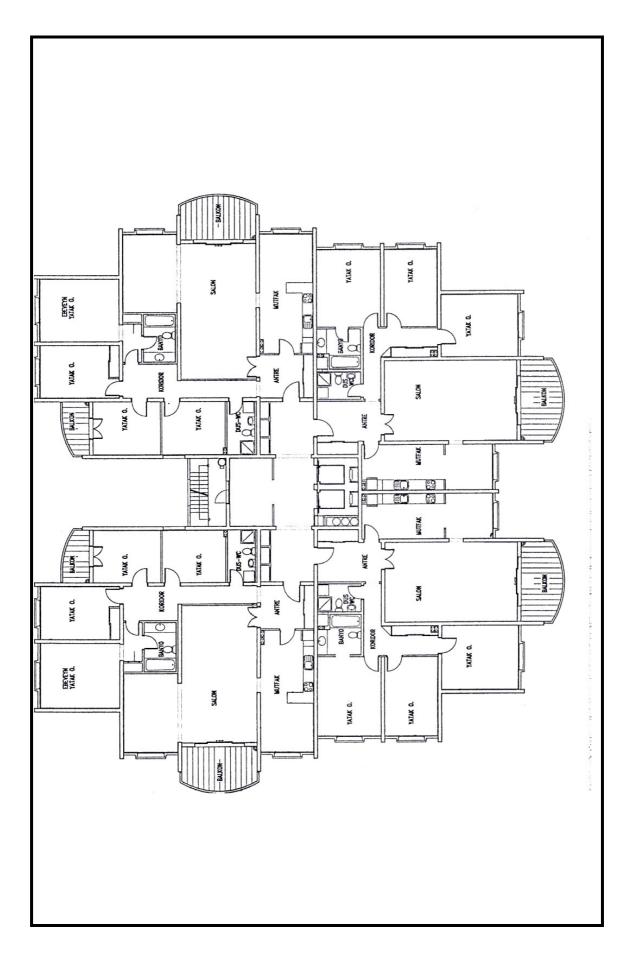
Mavişehir II; Albatros 1st–16th Floor Plan
